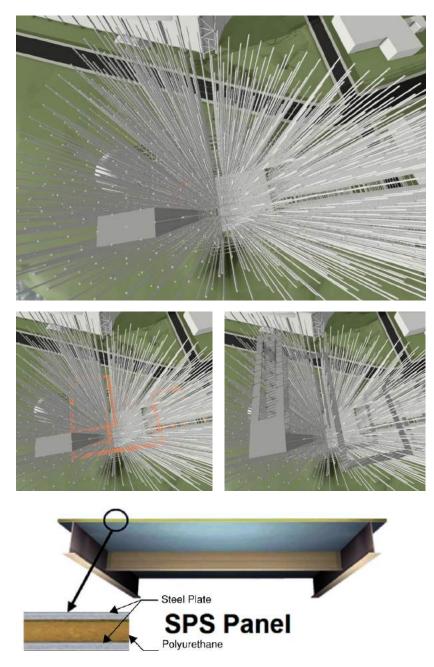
Ramp-ways and stairs are all supported by the 3d-CGF system. Stairs may be assembled from prefabricated sections, Ramps may be built from ground level up by securing SPS panels to horizontal members and then installing railings and other systems, such as lighting, power, and energy generation.
